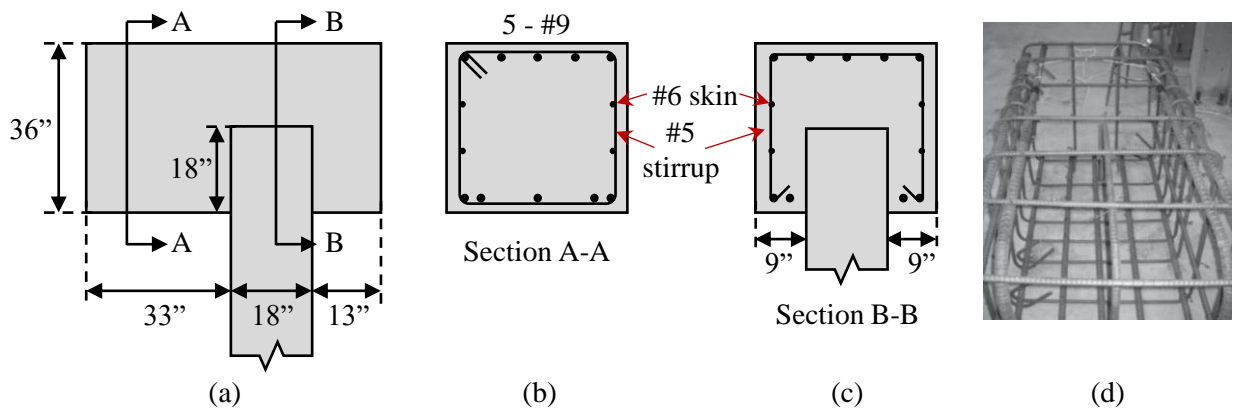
Control pile cap detail for Larosche et al. [15], (a) Elevation, (b) Section A-A, (c) Section B-B views and (d) picture of reinforcement cage for Specimen EB-18
